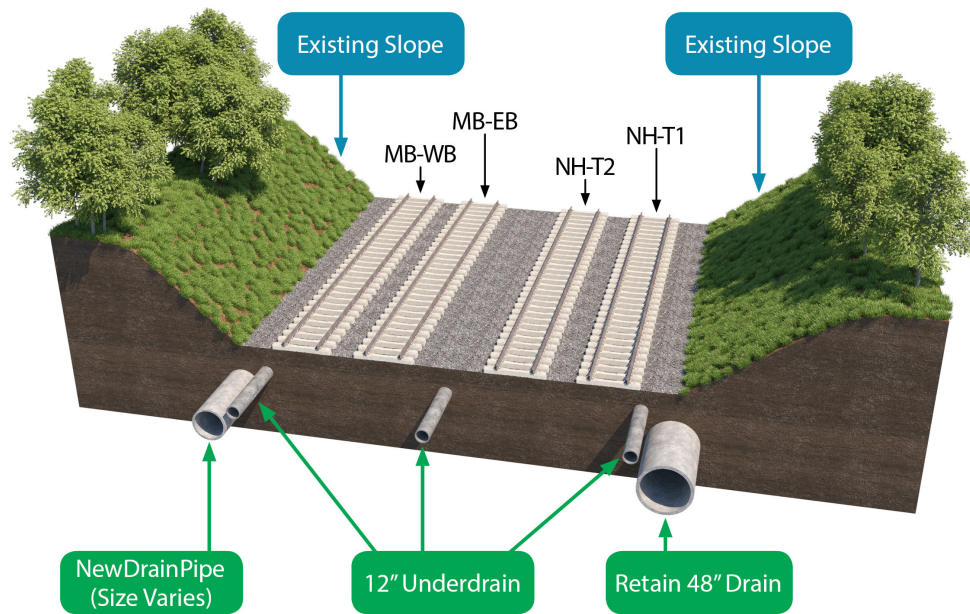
GLP’s design will retain the existing 30- to 48-inch drainage pipe on the east side of the corridor between Medford Street and Lowell Street, while providing an equivalent hydraulic capacity by adding a new pipe on the west side of the corridor, hydraulically connected to the existing east side system.
